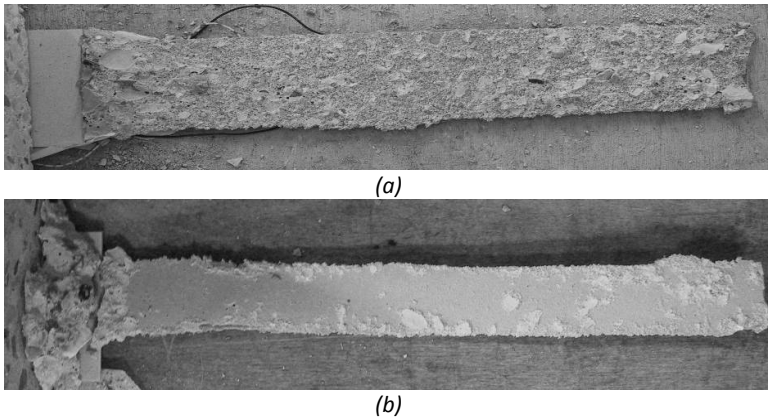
Cohesive failure in the concrete (a) and failure in the concrete-adhesive interface (b)
